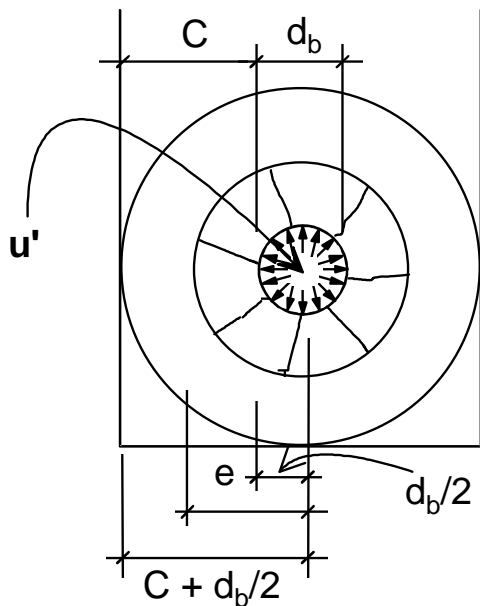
Forces between deformed bar and concrete (Ref. 1)
